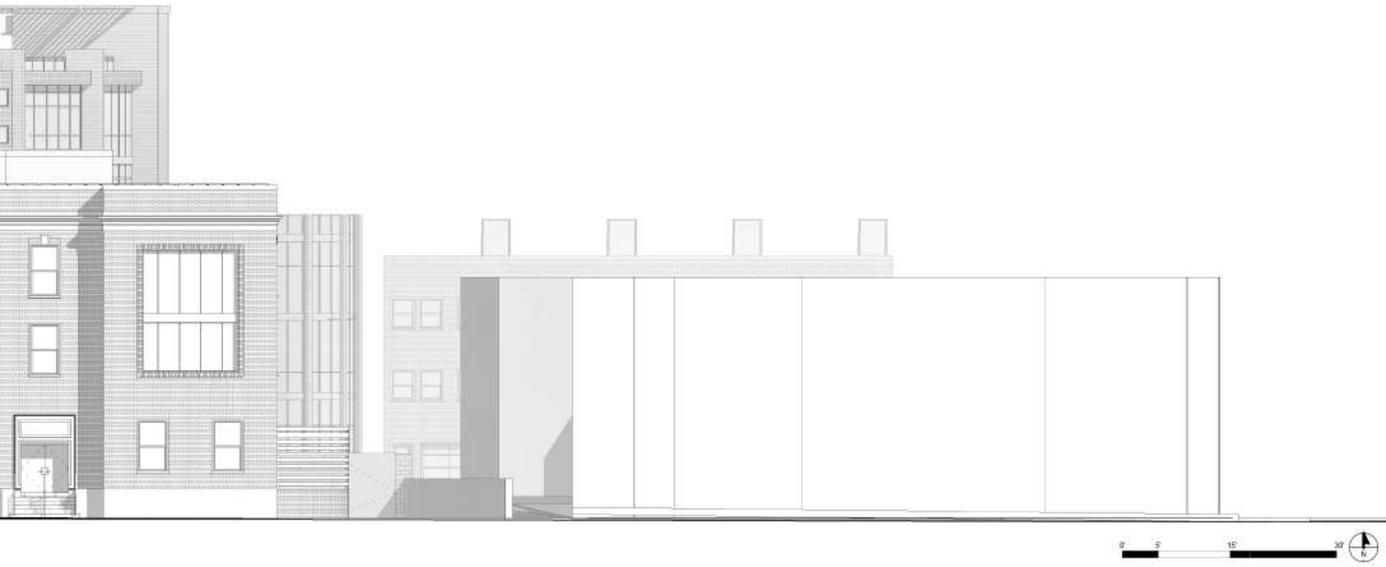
This rendering is of the front of the Bundy School building. I have added subtle interventions into the existing building, such as adding new windows in the bumped out area to provide light to all of the rooms. The addition is tucked behind this building as to maintain the historic character of the street, while also making the new building a "Hidden Gem" to be discovered.
